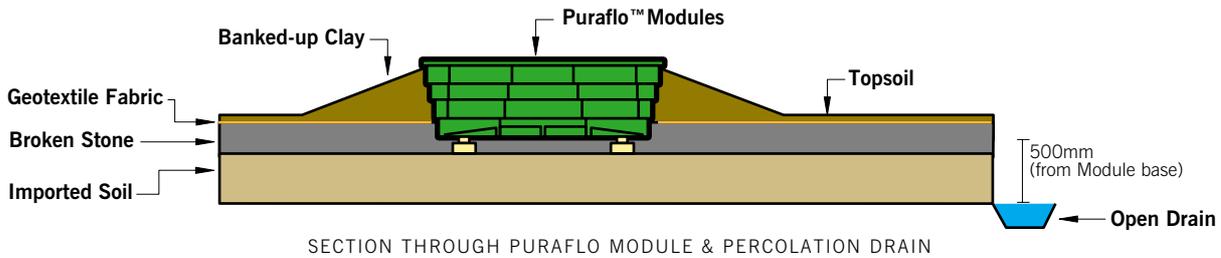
Disposal for Site with Poor Percolating Soil and Receiving Water. (Drawing not to scale)
